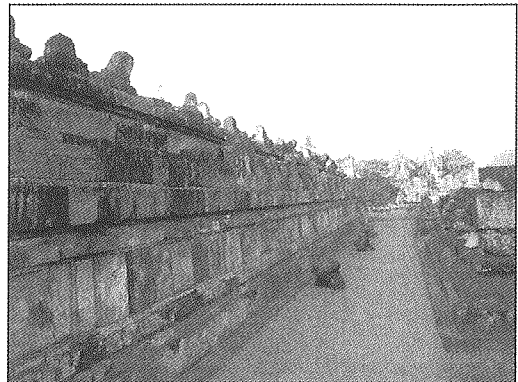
Dropped and tilted masonry of the fence wall of Prambanan temple at Site X
